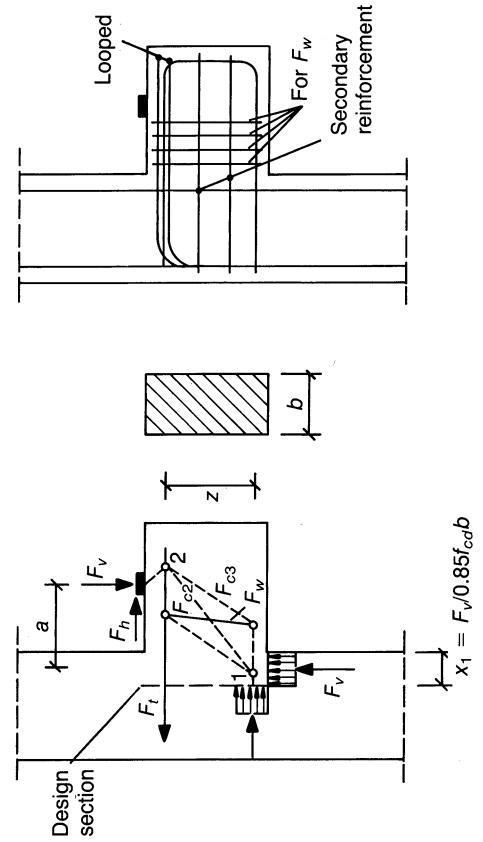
Truss model and reinforcement for a corbel (compare Fig. 6.8.3)
